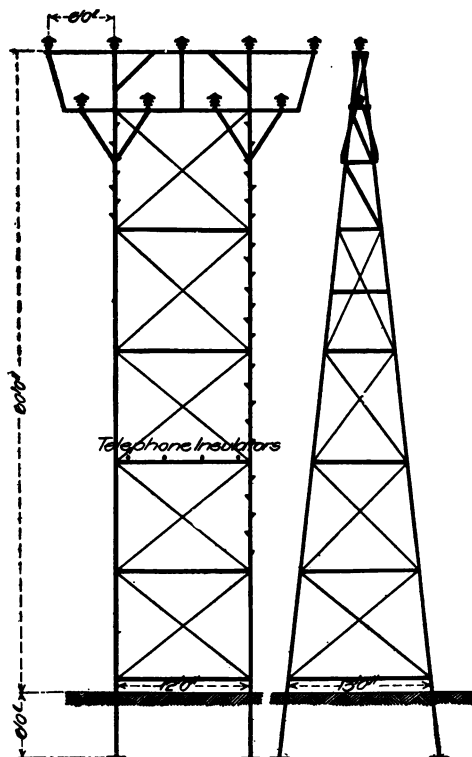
STANDARD 60-FOOT STEEL TOWER.
